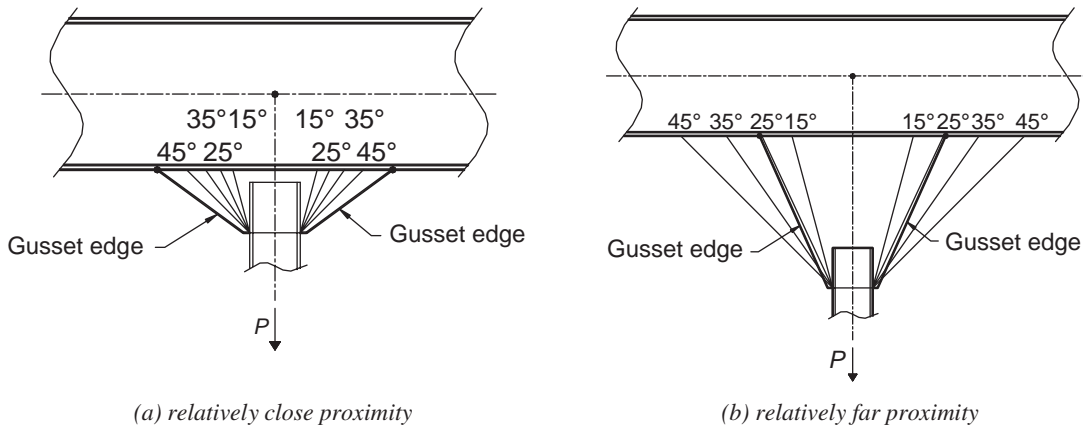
Fanned hanger connections—axially loaded interface welds.
